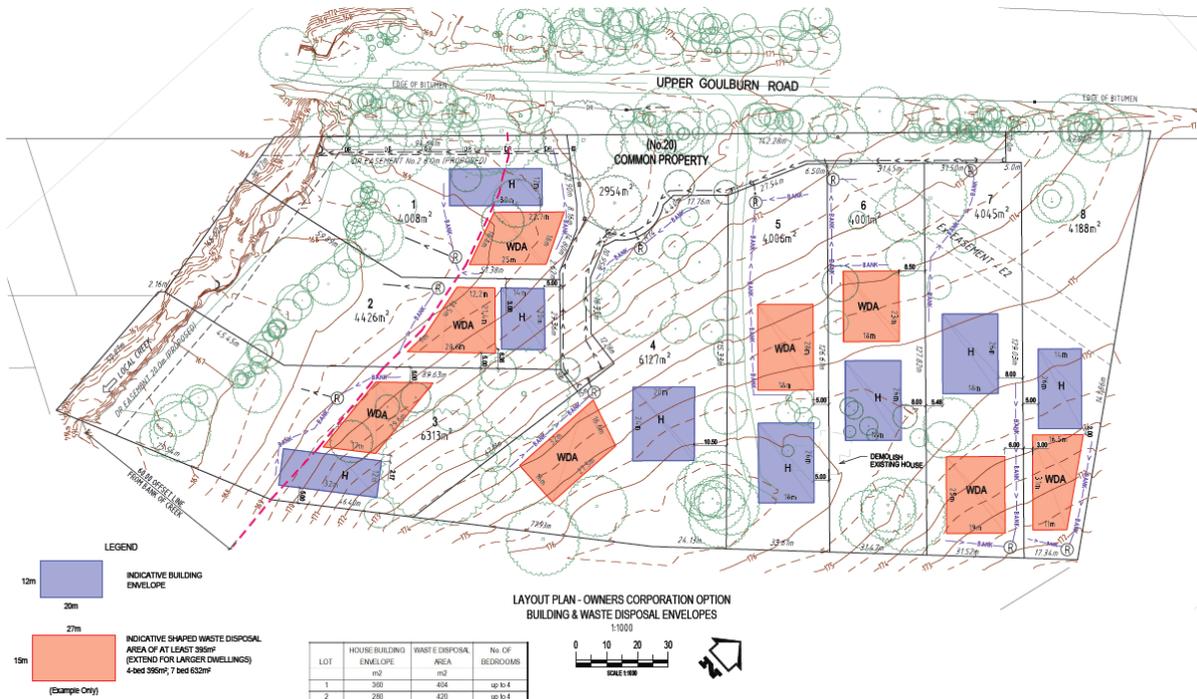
Building & Waste Envelope Plan of the proposal (Source - PGA, 2021)
